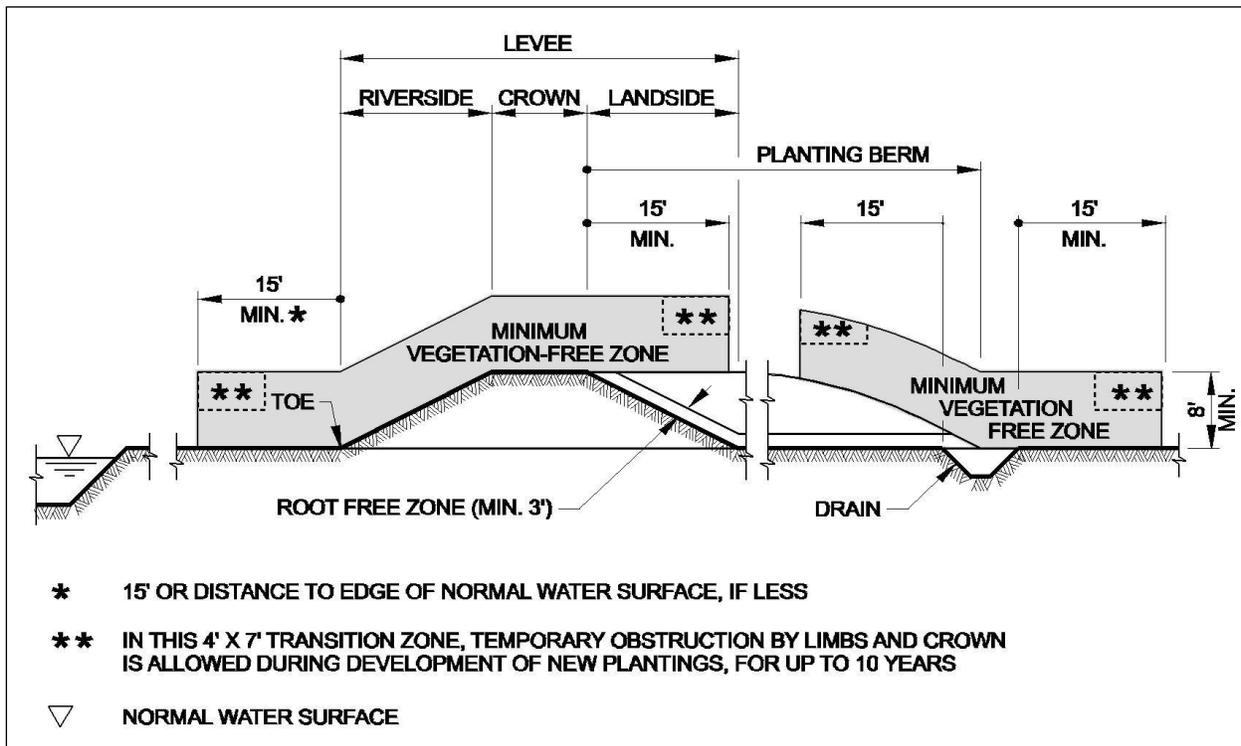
Levee Section with Planting Berm and Collector Drain.
